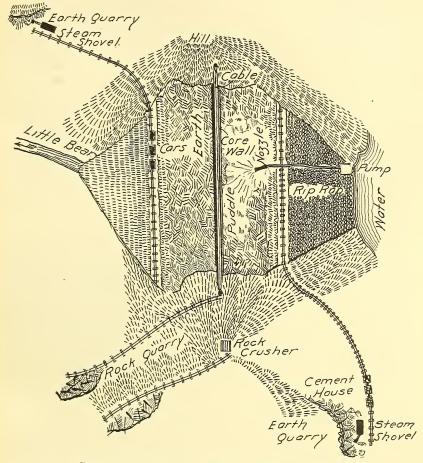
Plan of work at Arrowhead Dam, Little Bear Valley, Cal.
